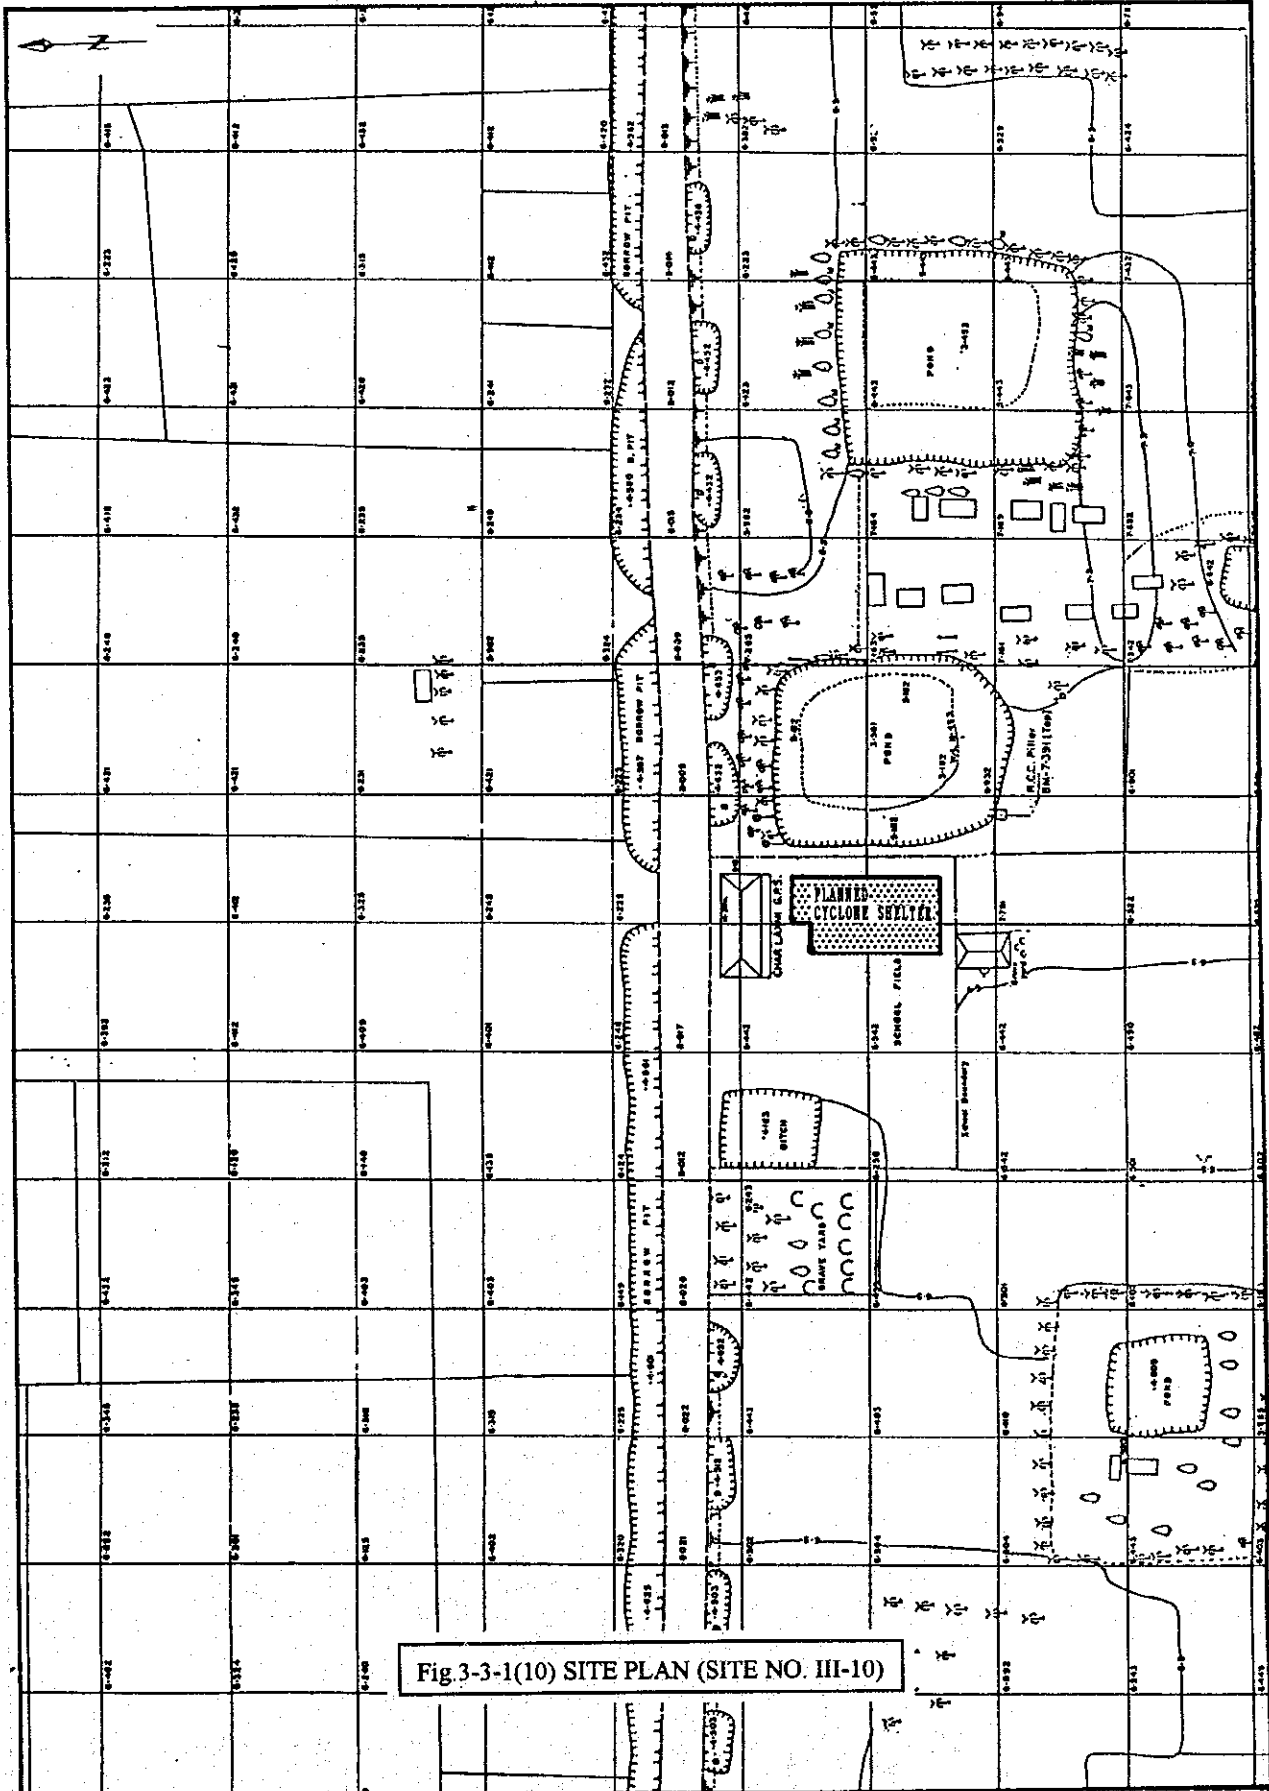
(10) SITE PLAN (SITE NO. III-10)
